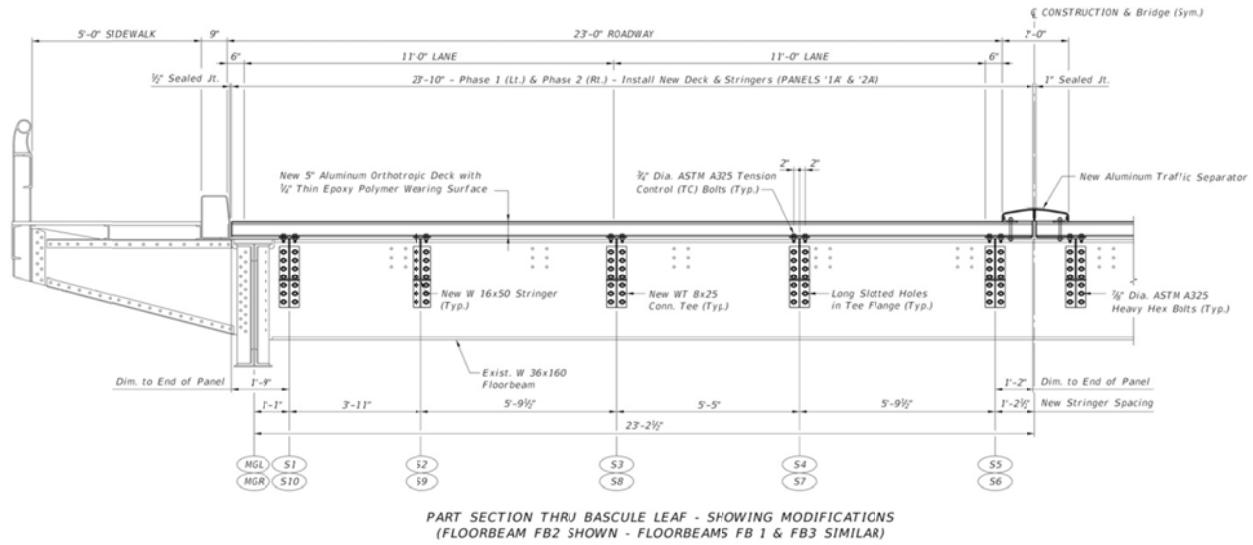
Typical Bascule Bridge Partial Transverse Section
